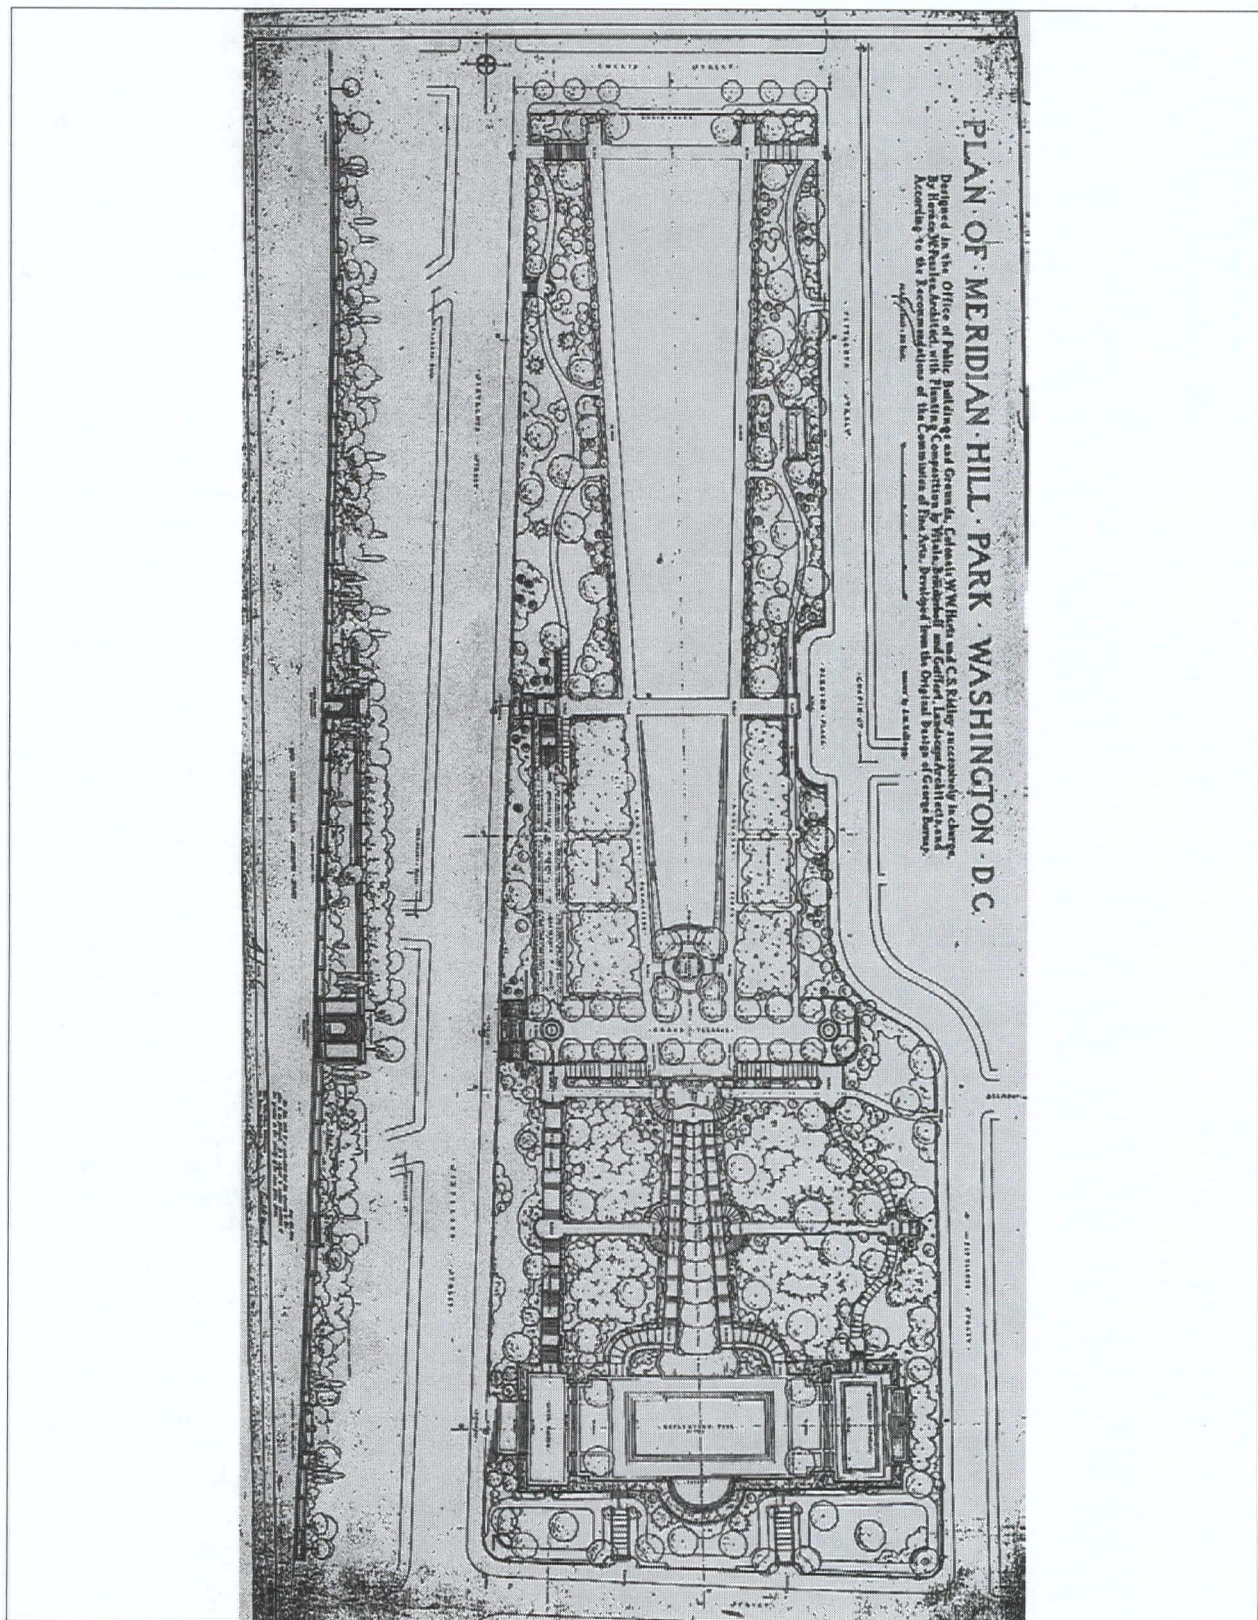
1920 Plan of Meridian Hill Park, Horace Peaslee, Office of Public Buildings and Grounds, approved as the plan to be followed, August 23, 1922. North is to the top of the plan, 16th Street to the left. Note that tall, regularly-spaced evergreens were to have lined each side of the mall and that one bridge across the cascades is now eliminated, as are the meandering paths in the hillside gardens (National Archives, RG 79, 41-6).
